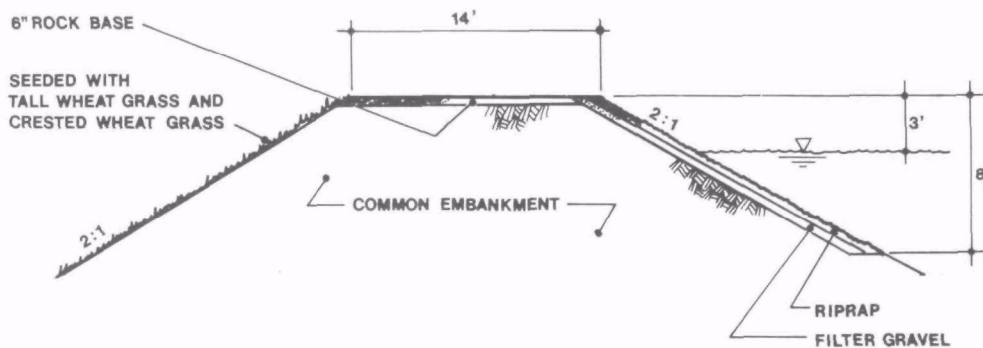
Method of dike protection at the Logan waste stabilization ponds.
